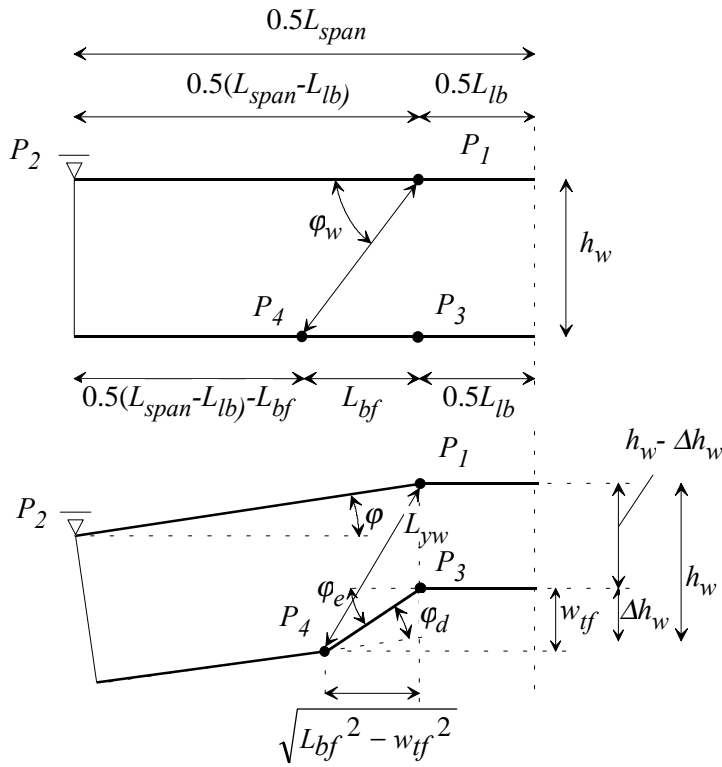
Not deformed and deformed longitudinal section of sheet section.
